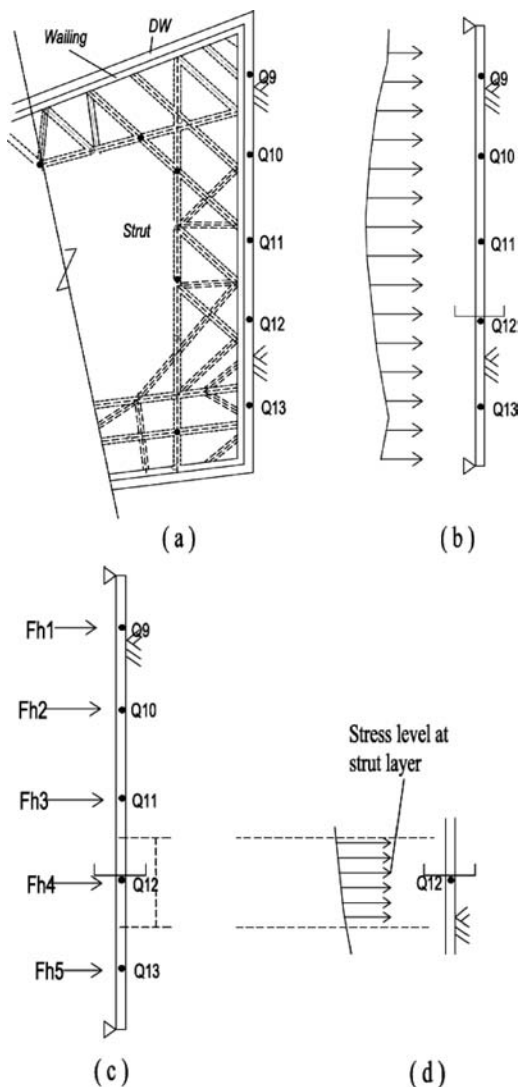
Plan section: (a) Plan of strut layout; (b) Line loads on diaphragm wall from wailing; (c) Converted point loads; (d) Calculated support stress on diaphragm wall.
